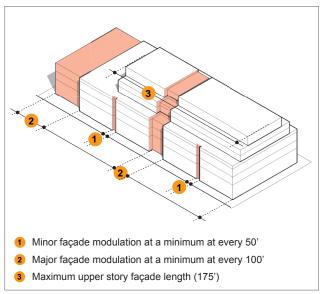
Vertical Façade Modulation and Upper Floor Façade Length
